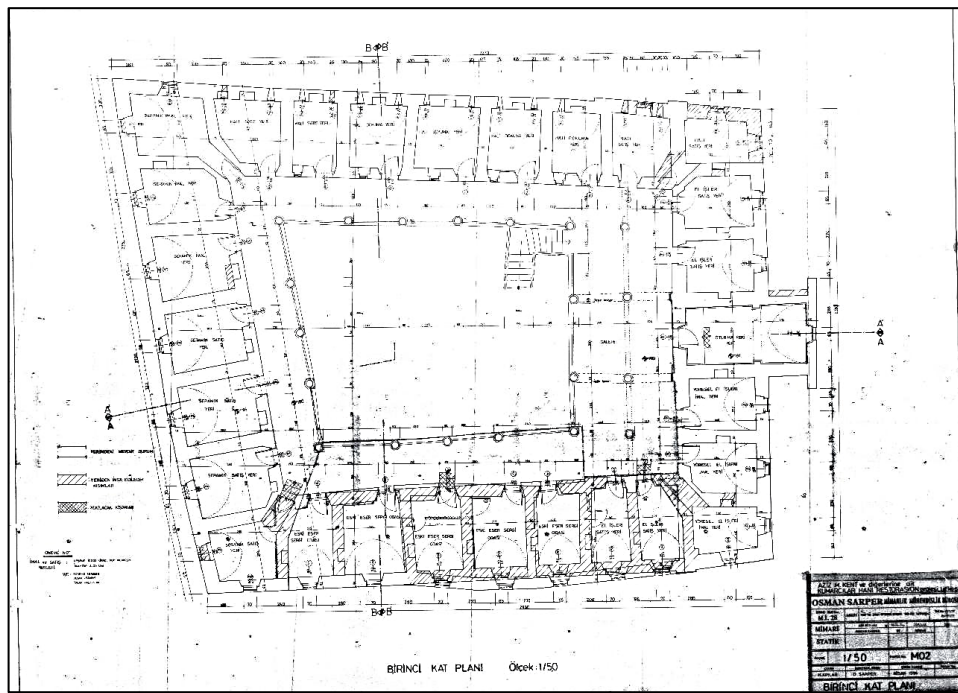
First Floor Plan drawing of Kumarcılar Hanı.
